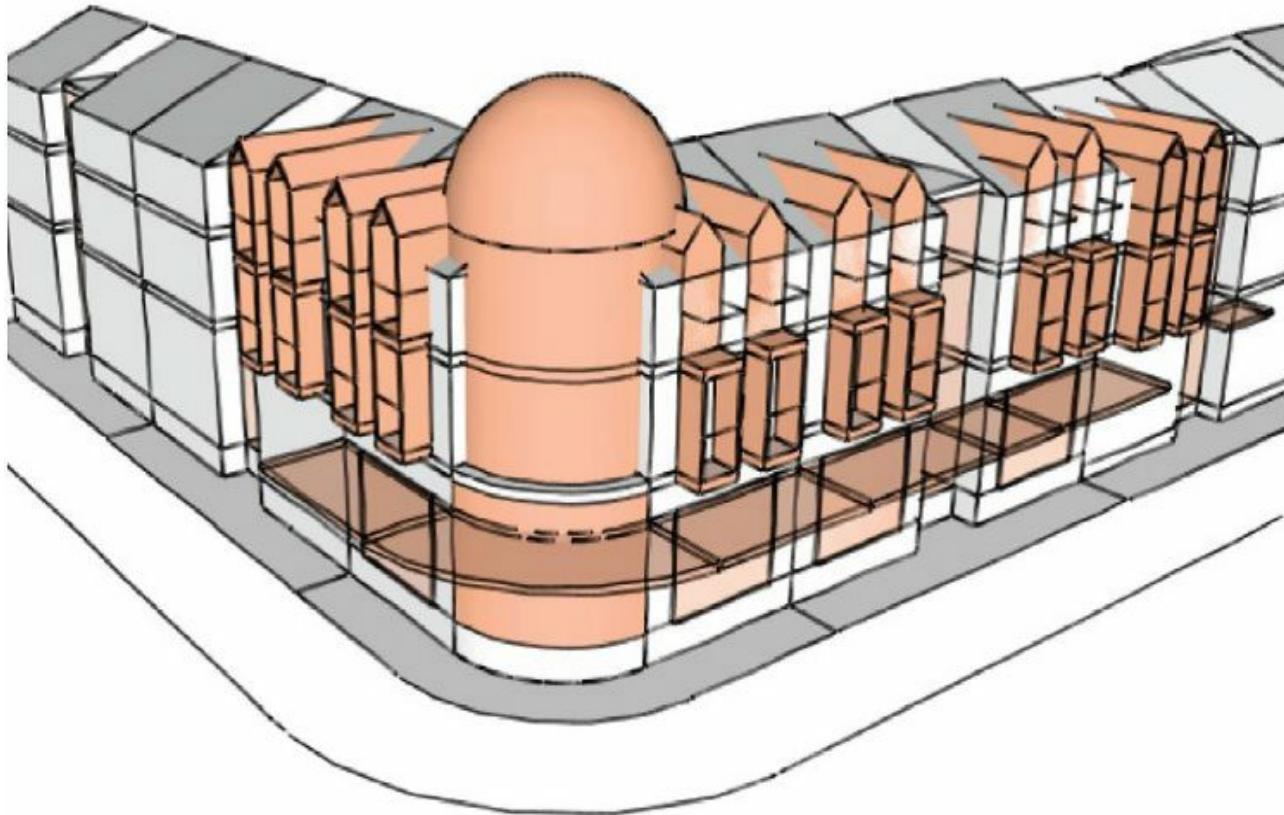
Typical Allotment Layout of a Corner Walk-Up (indicative only — Layout and size may change)
